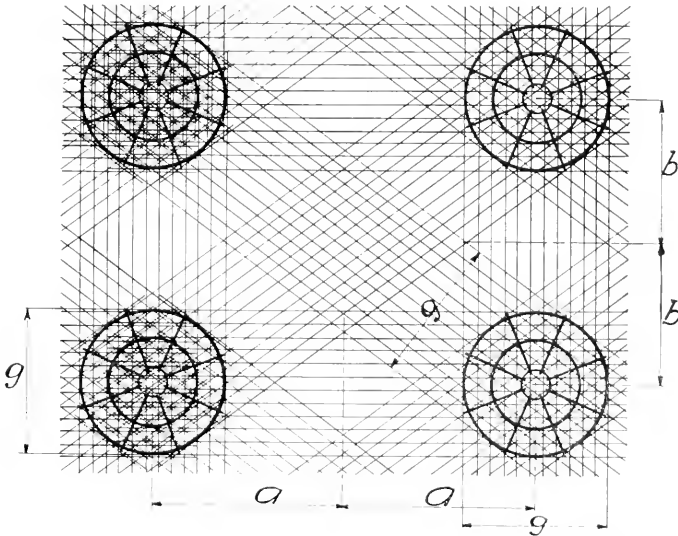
Plan of Reinforcement in Standard Mushroom System. Radial and Ring Rods, Collar Band and Slab Rods. Diameter of Head $= g = \frac{1}{16}(a+b)$.
